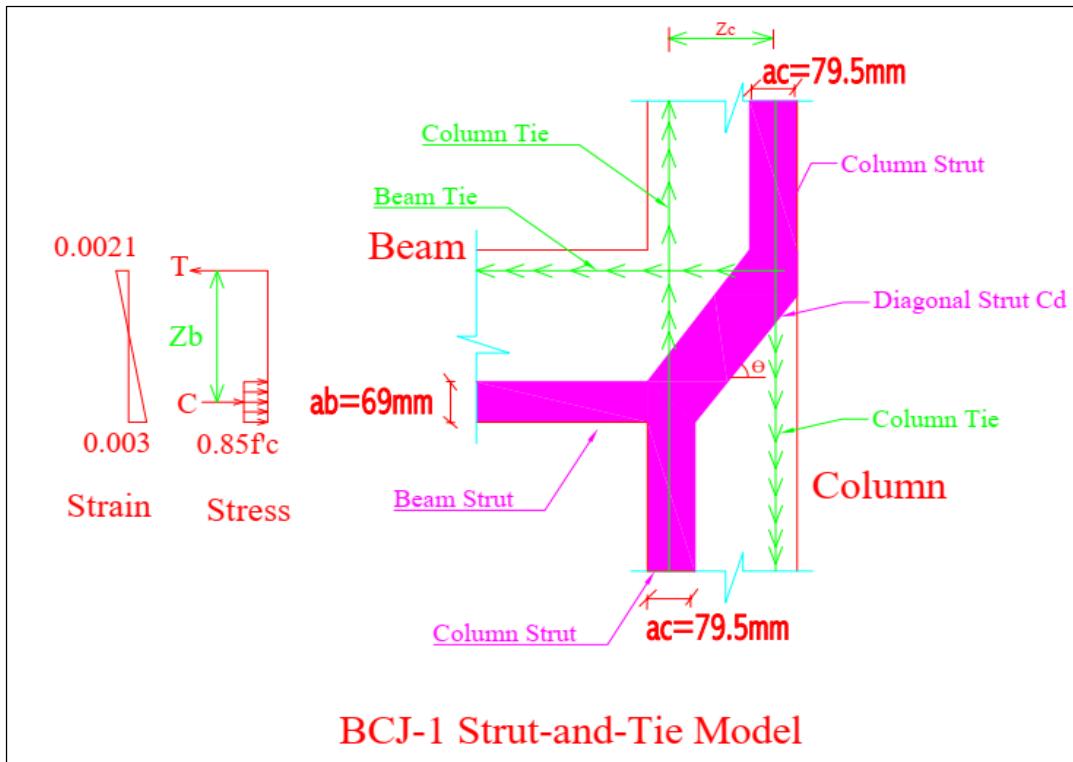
Strut-and-Tie Model of Beam-Column Joint-1
